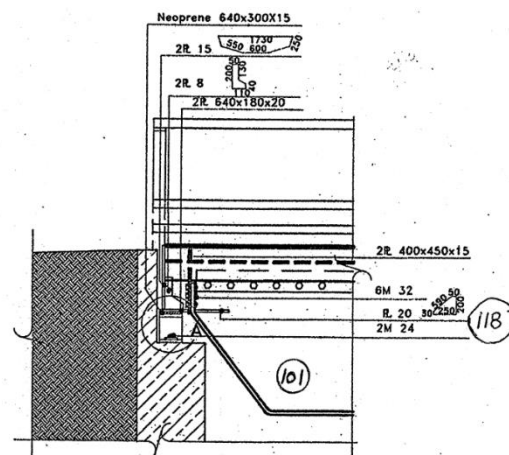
Details of the connection of the bridge deck to the abutment [14]
